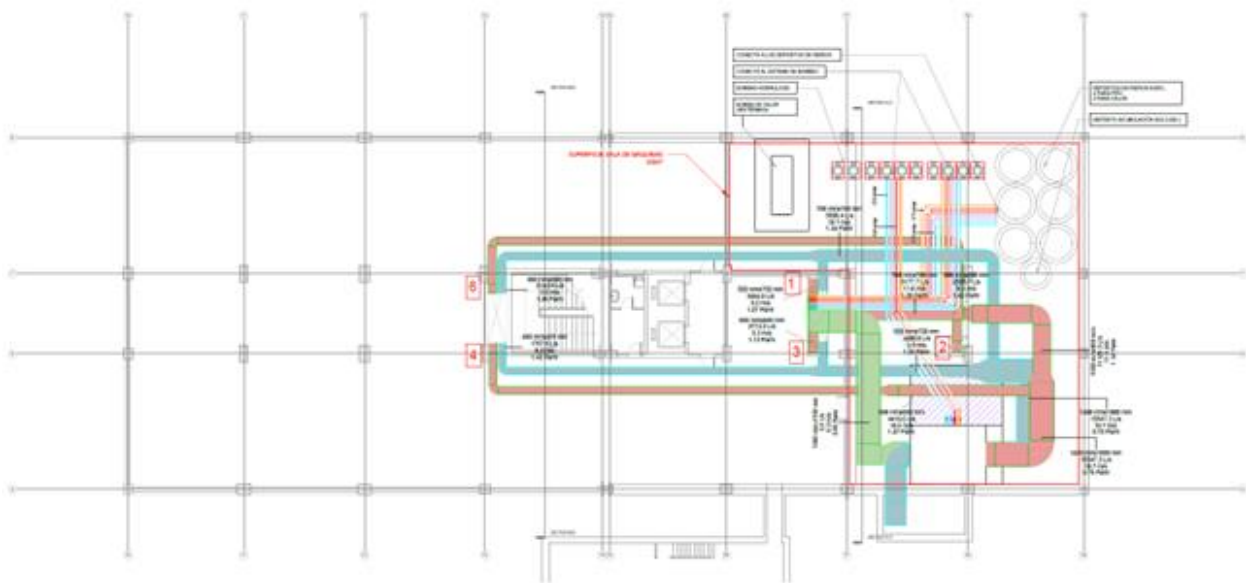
Engine room on floor -2 (source: AIGUASOL).
